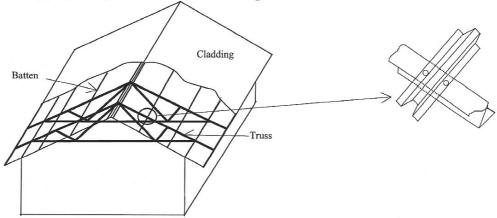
Typical truss batten layout on house and a top-hat batten connection detail
